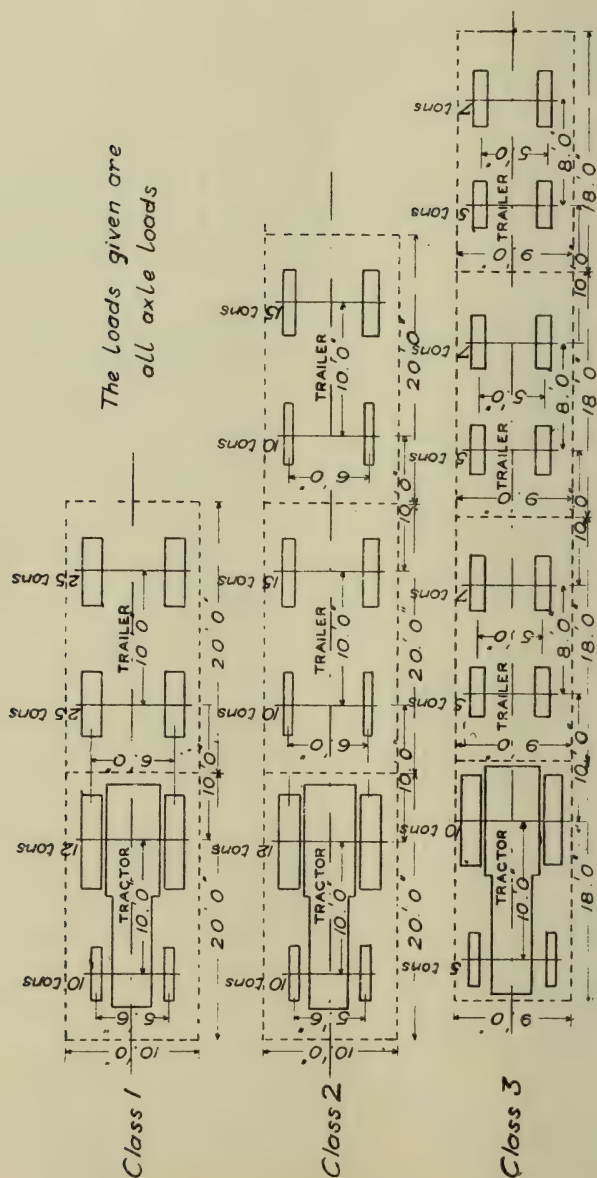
Typical Maximum Loads for each Class of Bridge.
